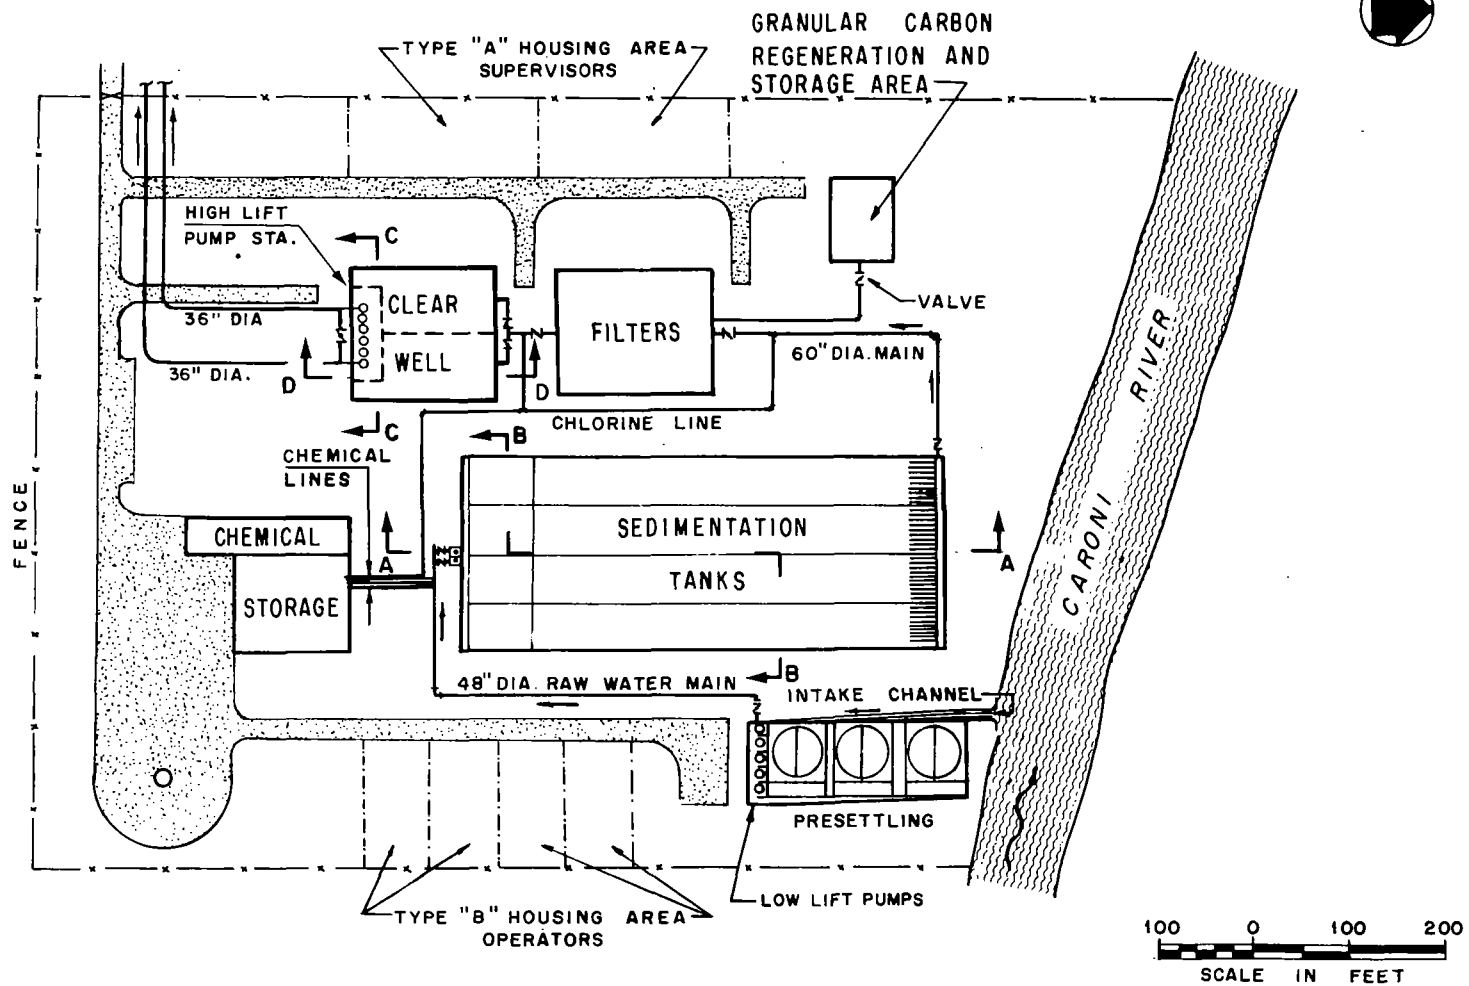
CARONI WATER TREATMENT PLANT – PLAN
